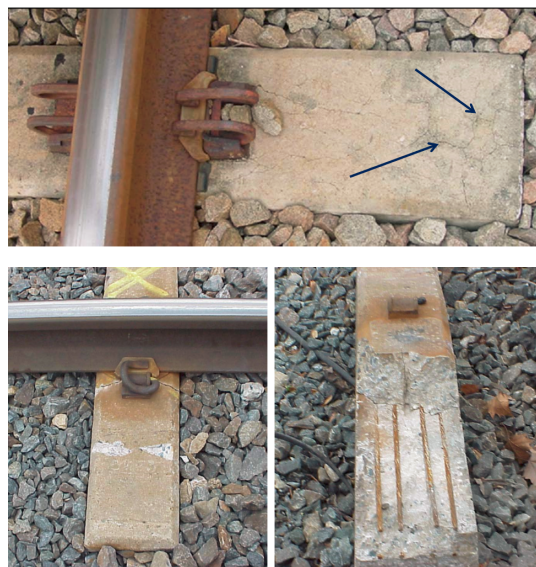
Cracking and spalling of prestressed concrete ties due to ASR and DEF.<sup>11</sup>
